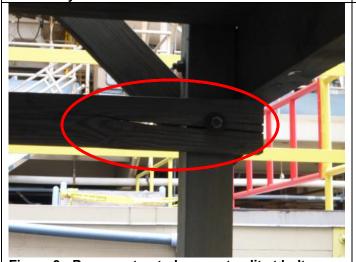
Pressure treated support split at bolt, on Cooling Tower Access Stairs – New Deficiency
